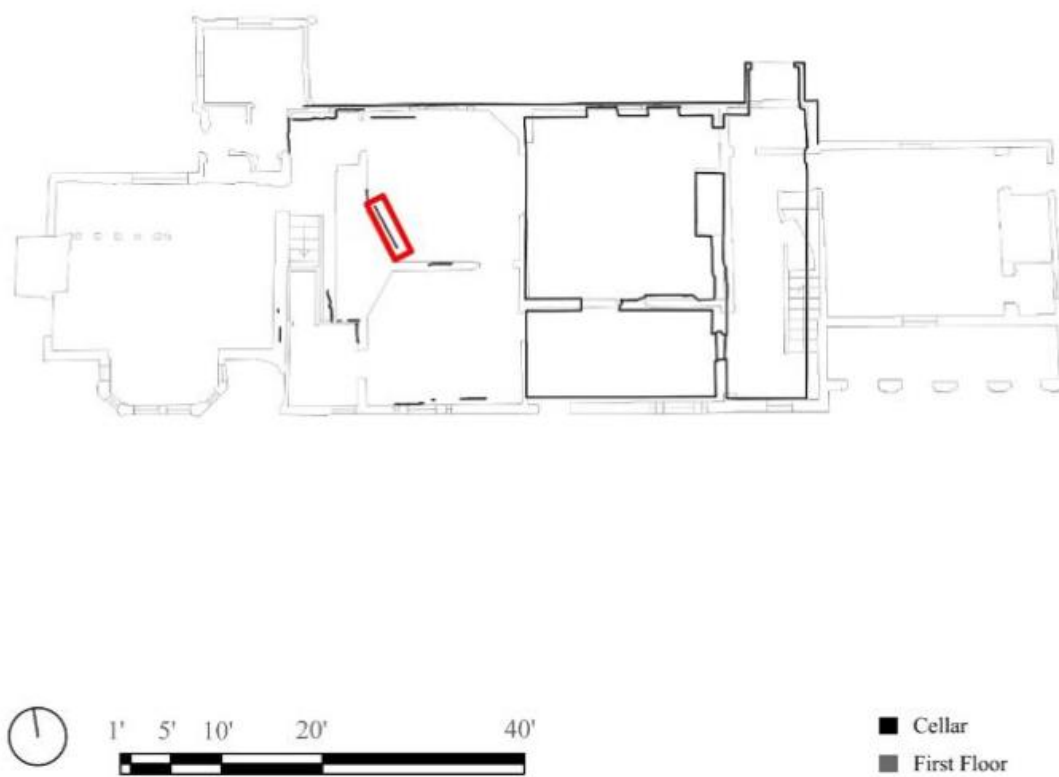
The location of the wall enclosing the cavity under the first-floor corner fireplace that has one-to-three American bond. When the 3D data from the cellar is overlaid over the first-floor plan, it is confirmed that the diagonal wall captured by the data is the wall that encloses the cavity.
